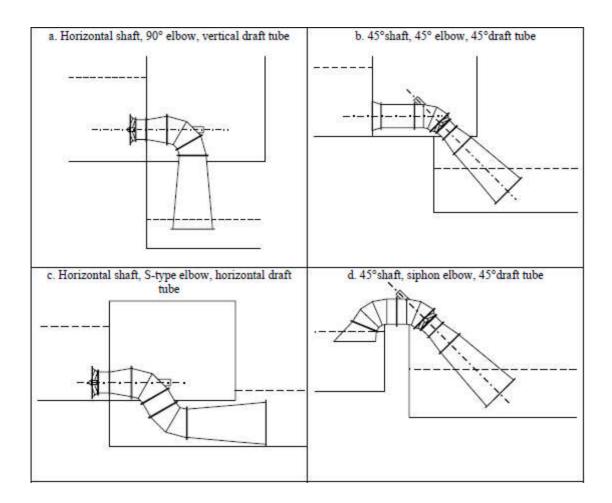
Tube turbine layout examples for decreasing head (Davison and Bacon, 2004)
